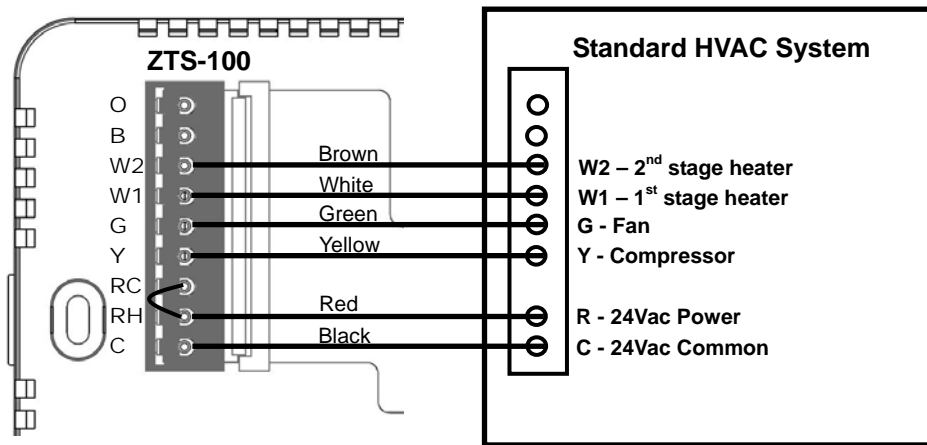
Non-heat pump (Standard Gas or Electric) HVAC system wiring
